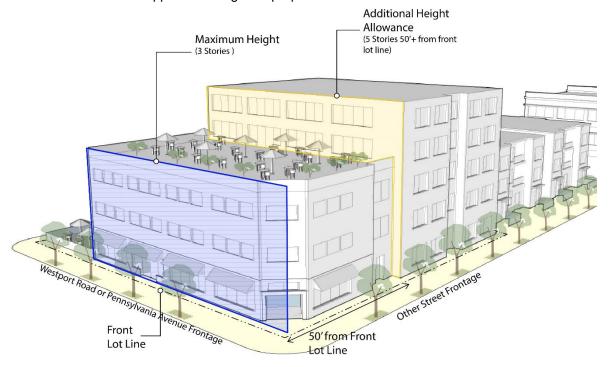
Maximum Height Allowances. Fronting on Westport Road or Pennsylvania Avenue, buildings shall not exceed three stories in height unless a public parking agreement has been established per Section 3-C.5. Beyond 50 feet of the front lot line, buildings may add an additional two stories of height.
